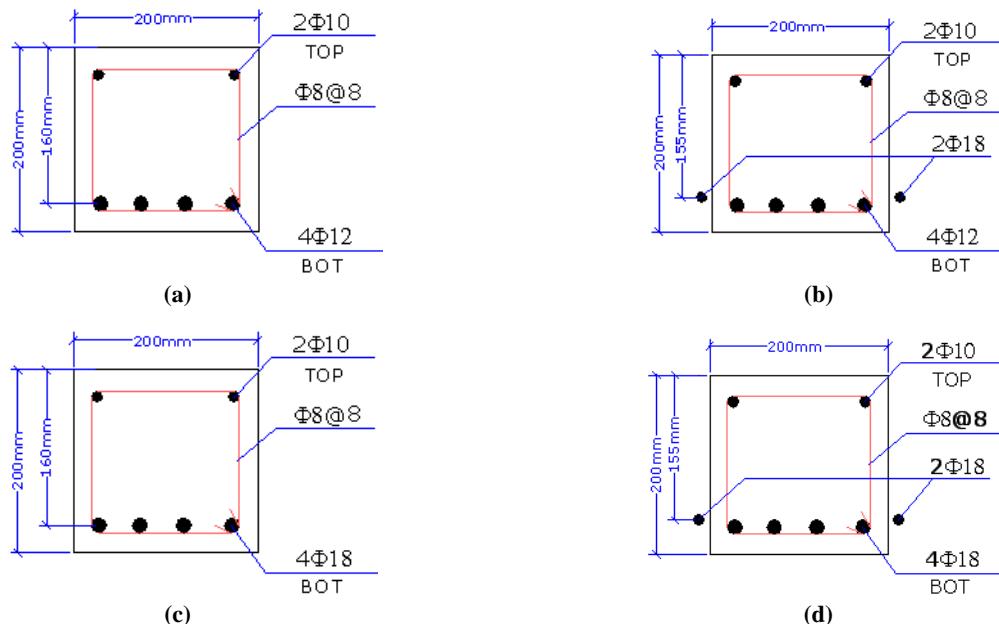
Cross sections of test beams, (a) beam A1;(b) beams A2 to A6;(c) beams B1; (d) beams B2 to B6
